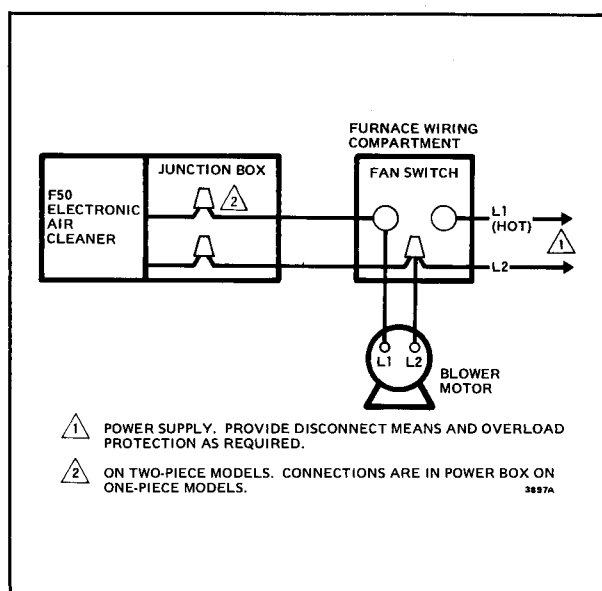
SINGLE SPEED BLOWER MOTOR. AIR CLEANER IS CONTROLLED BY THE FAN SWITCH.
